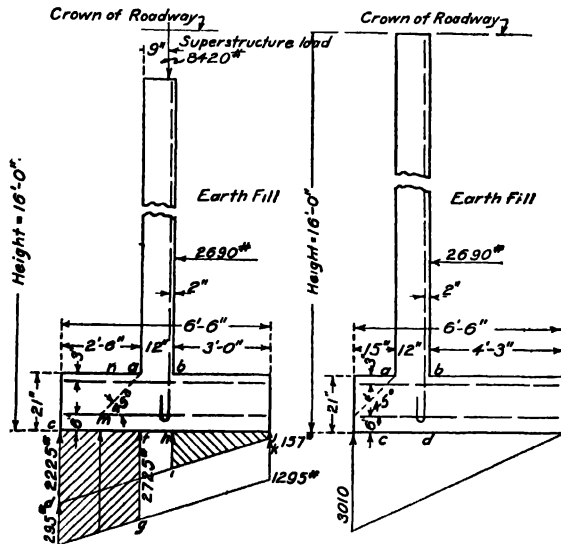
Section of abutment. FIG. 12.—Section of wing.
